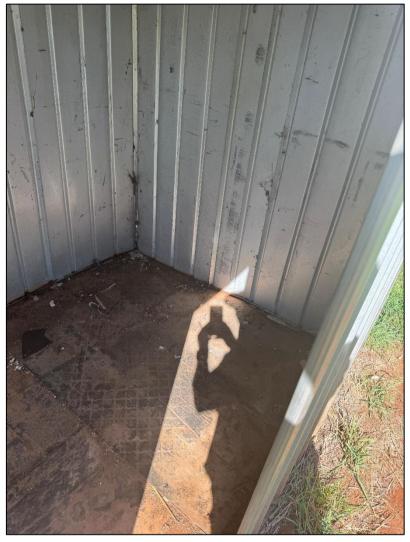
View within shed east of the southeast corner of the residential building on the Site. Dated 27 January 2025.
